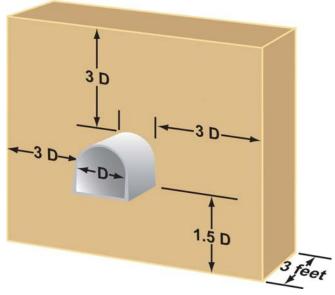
Typical configuration for filter diaphragm used in the design of an embankment dam.
